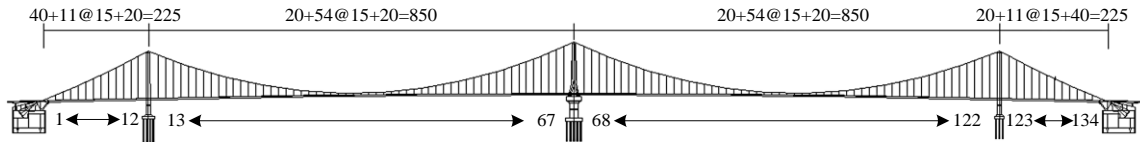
Elevation view of Yingwuzhou Yangtze River Bridge (units in meters)
